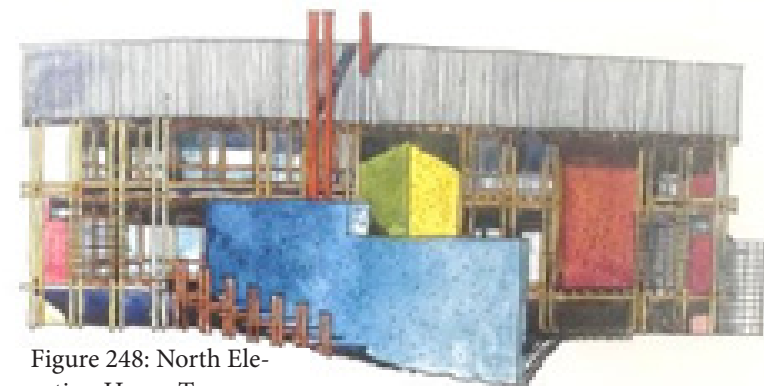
North Elevation House Tzaneen (Joubert, 2009: 58).
